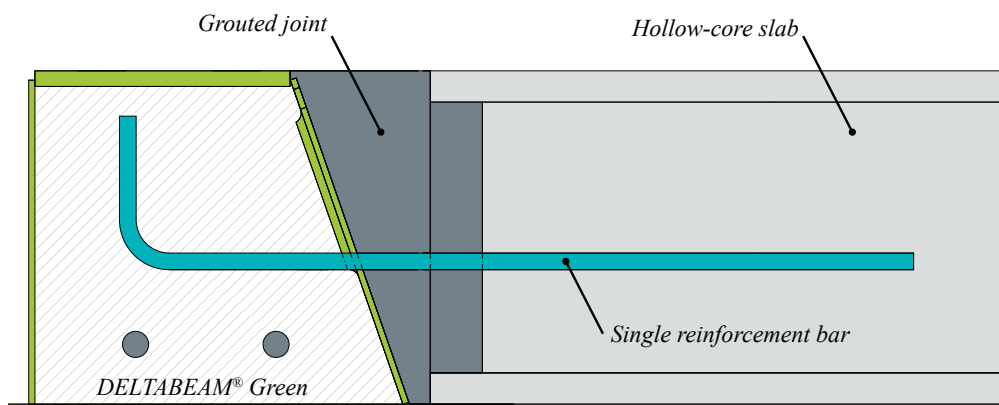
Detail from the joint between a Deltabeam and a hollowcore slab
